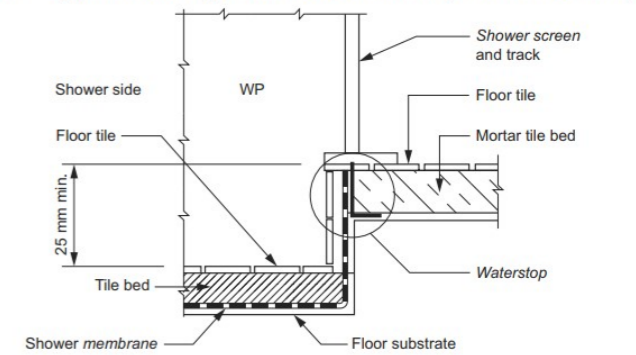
Typical enclosed stepped down shower construction (membrane above tile bed)
